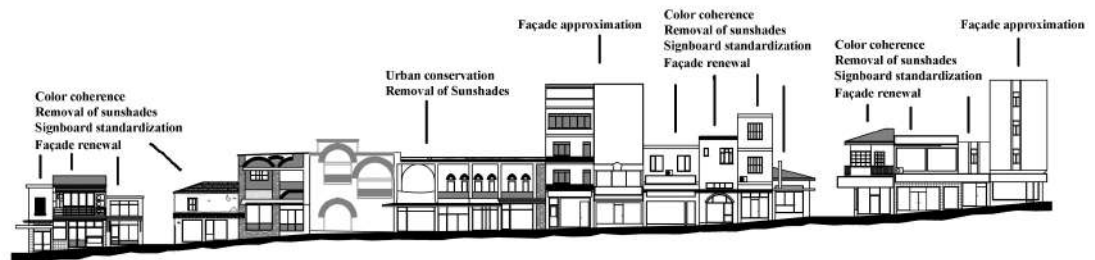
Sample Façade Renewal Suggestions for Atatürk Road
